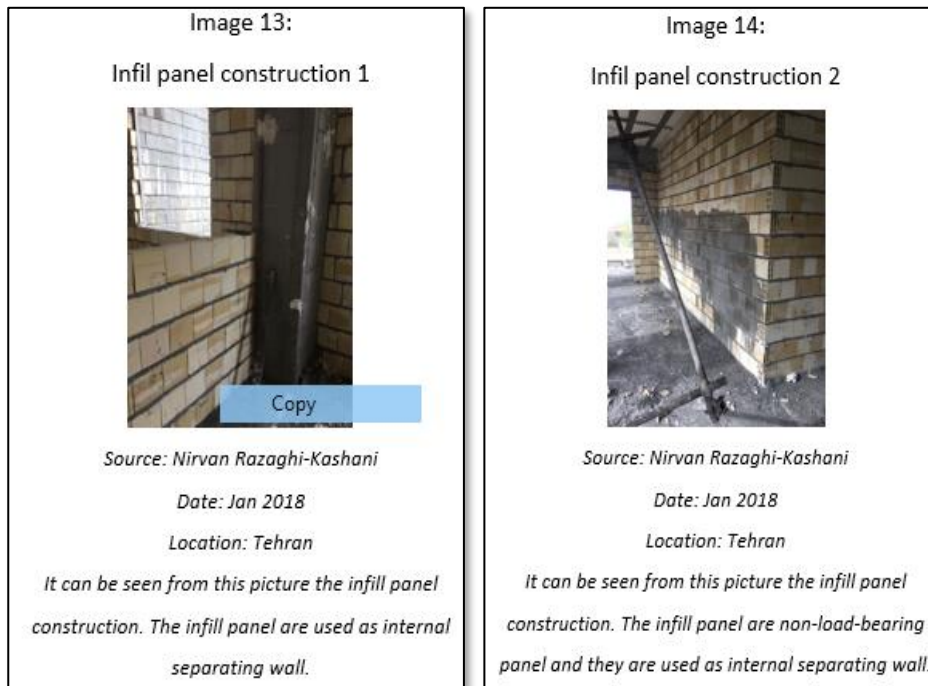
Images of a non-structural brick panels in a building in Tehran, (source: Nirvan Razaghi-Kashani).
